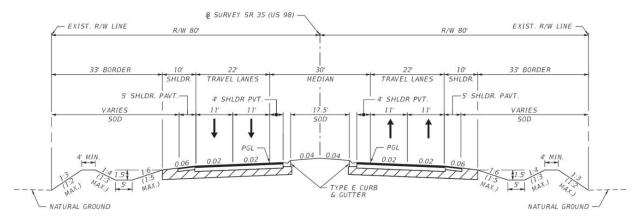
SR 35 (US 98) C2 Typical Section from MP 11.372 to MP 17.678
